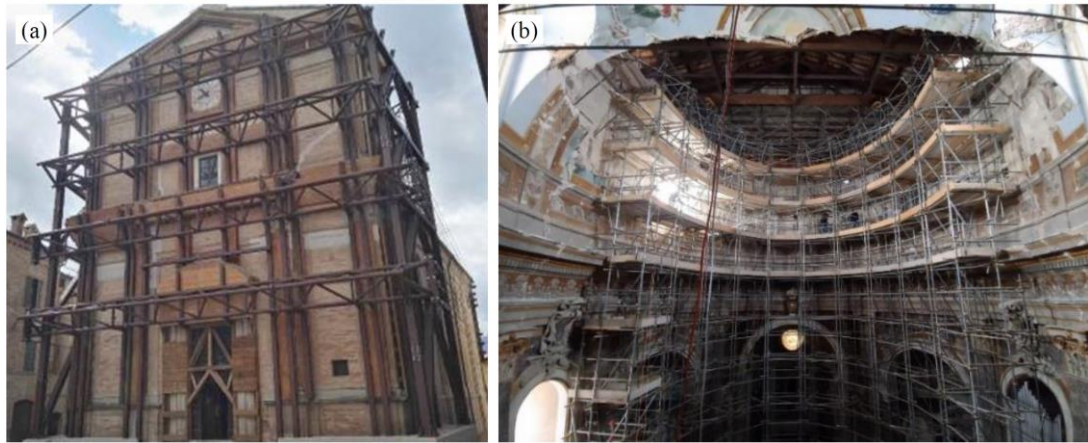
Securing system: (a) exterior structure against façade overturning, (b) interior structure to prevent the collapse of tiburium walls.
